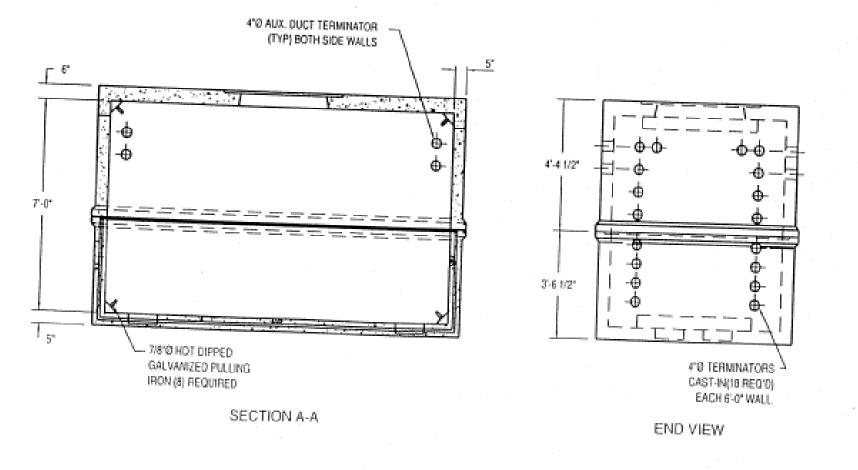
DETAIL DRAWING FOR BA6X12-7GRII TWO PIECE DESIGN
